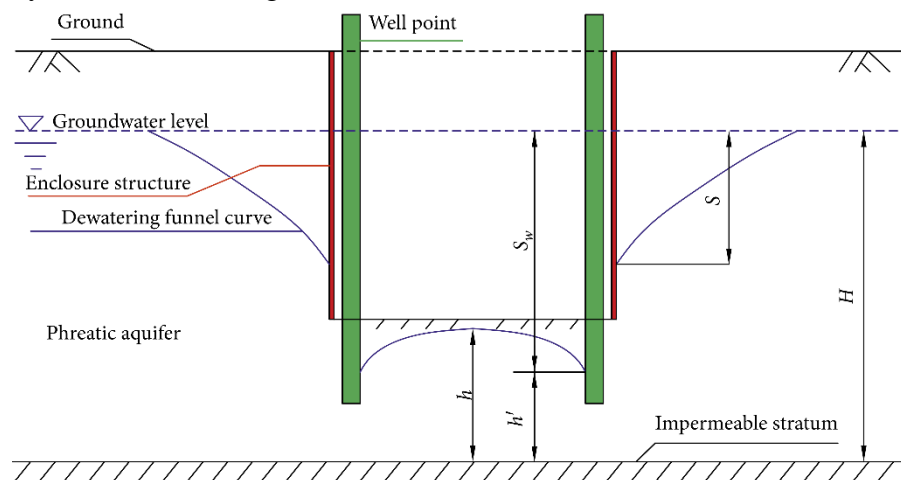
Schematic diagram of finite element analysis of open pit deep foundation
